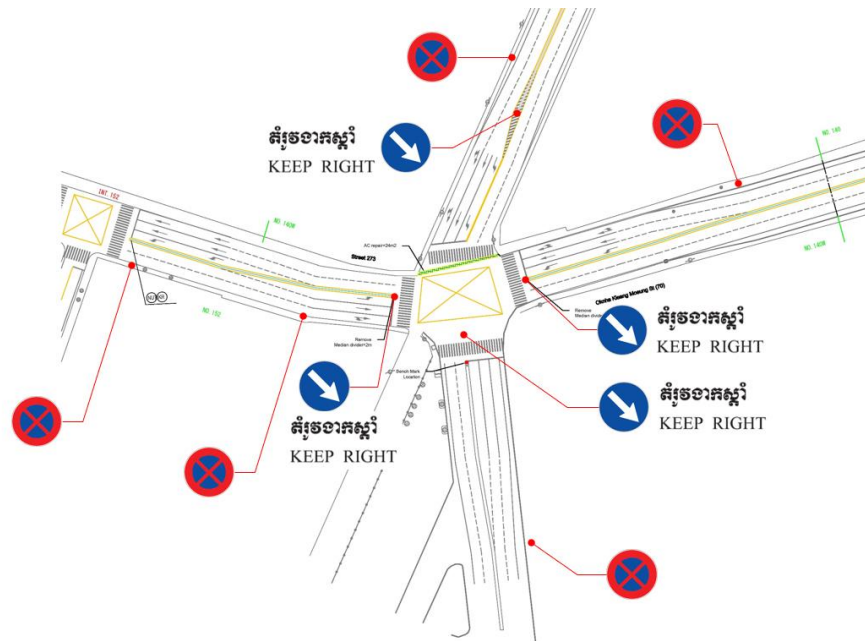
Examples of the Installation of Traffic Signs at Intersection #165
